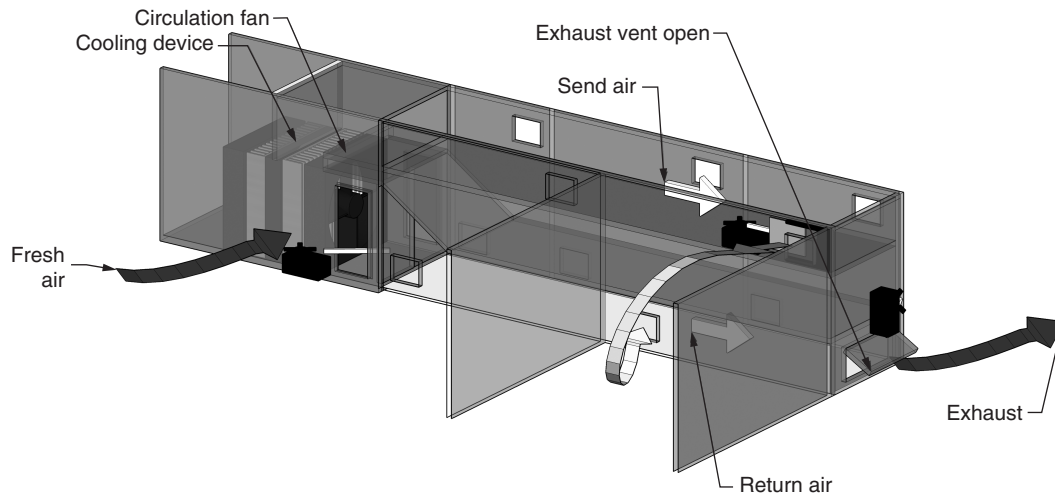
CAD “cutaway” drawing of cooling tower bypass doors in “fresh air” mode.
